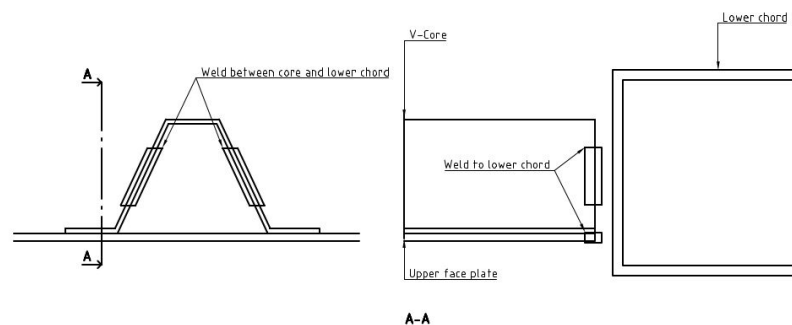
Weld required for the connection between the lower chord and bridge deck.
